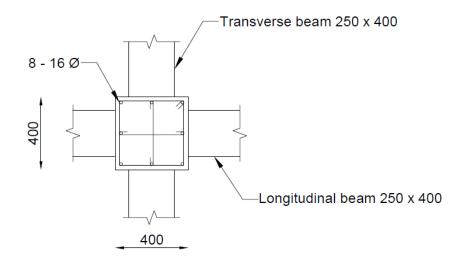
Detailing for Columns from 3rd floor to 5th floor
